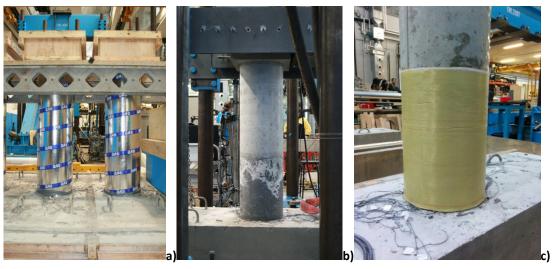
Large scale specimens a) Formwork, b) Rubberised concrete column c) AFRP confined column
